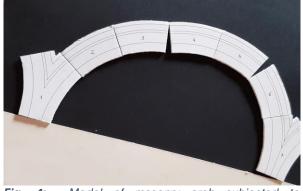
Model of masonry arch subjected to gravitational load and horizontal action.
